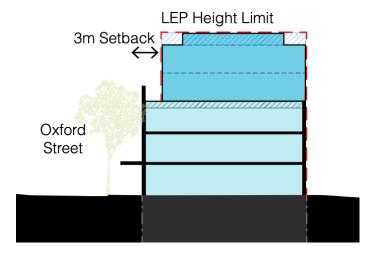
Above the street wall on Oxford Street, additional storeys are to be set back a minimum of 3 metres 5.X.4.3(1)
